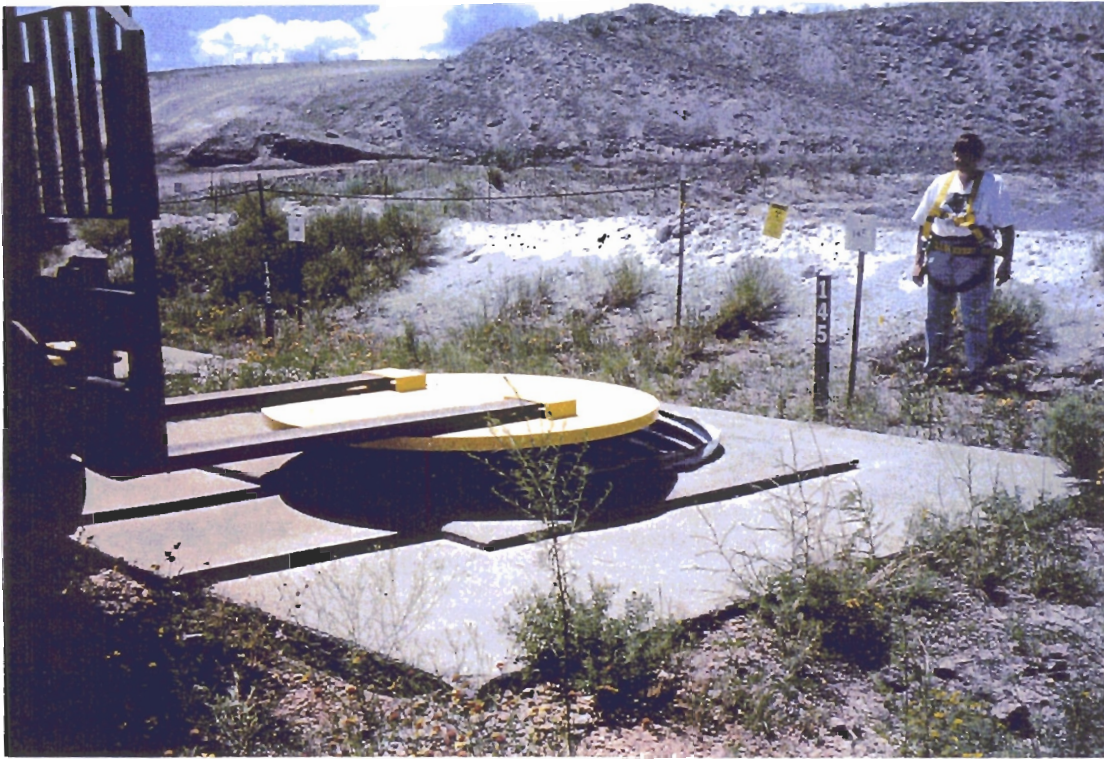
Operational Cap Removed for Inspection, Storage Shaft 145
